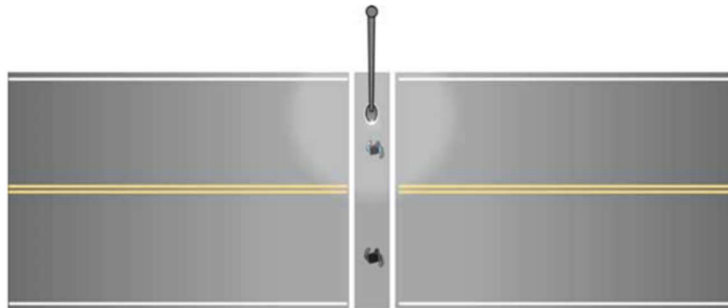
Drawing. Traditional midblock crosswalk lighting layout.
